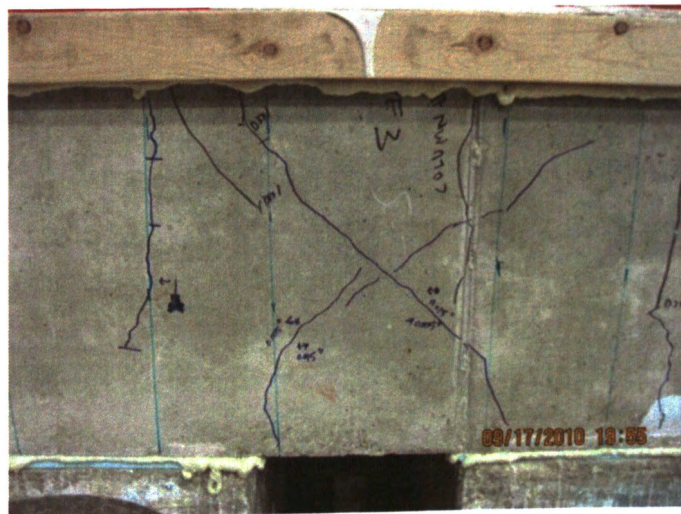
Shear Cracking in Footing Observed During Column #1 Testing
